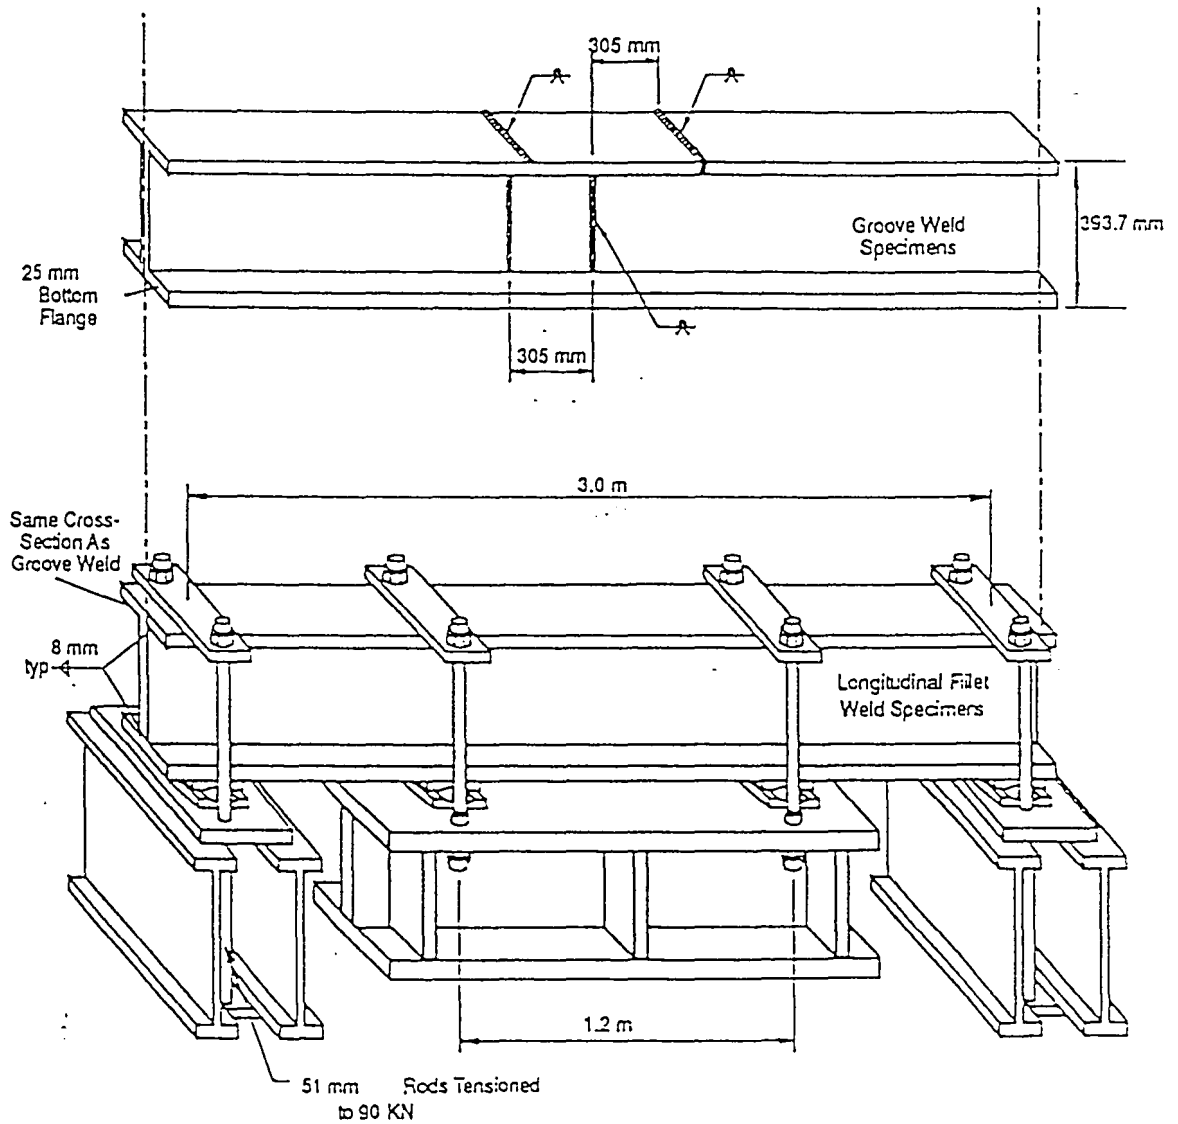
Fatigue Test Setup and Specimens. Longitudinal Fillet Weld Specimen Shown With Typical Test Fixture.
